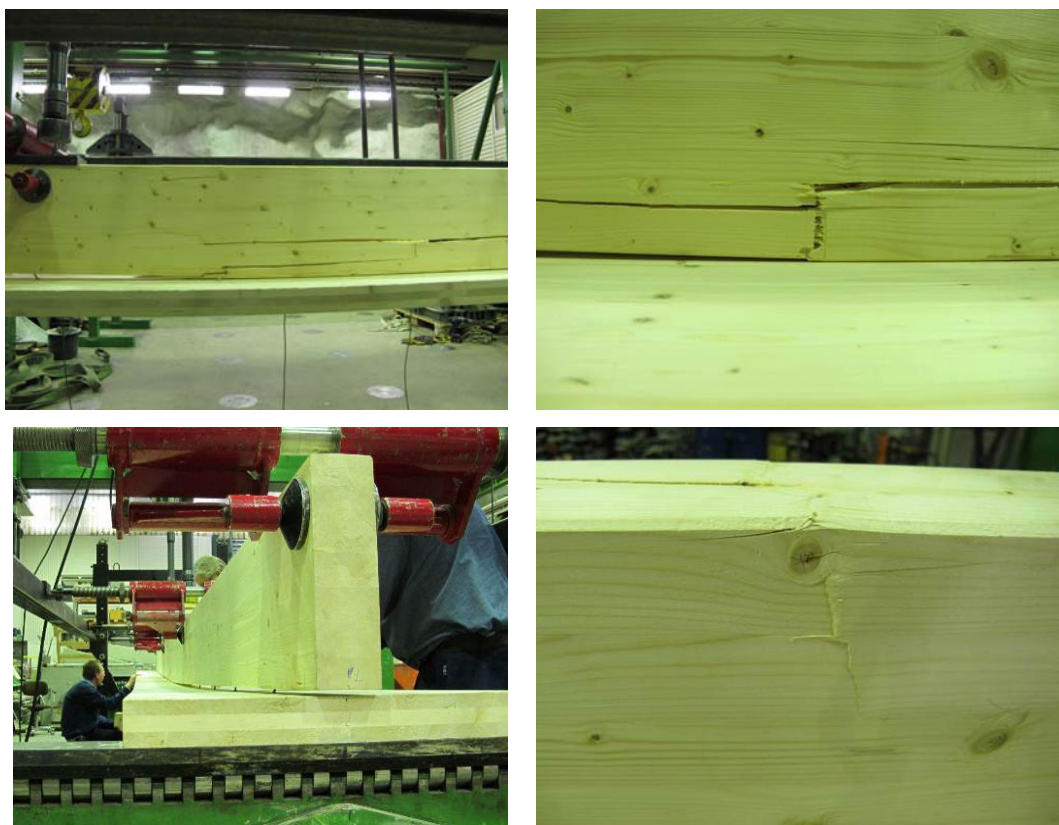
Pictures of beam specimens after failure (Series B1_S)
